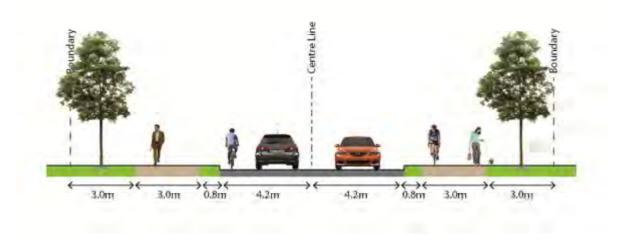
Typical Cross Section of a 22m Road Reserve
